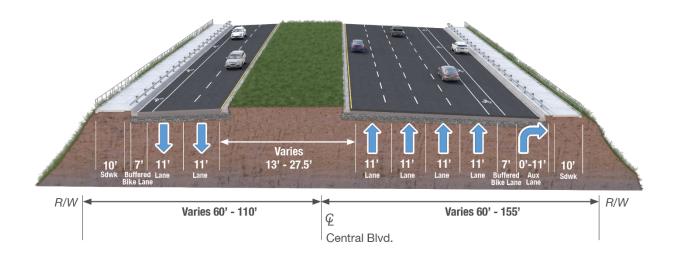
Proposed Typical Section-Central Blvd. West of I-95 - TDUI
